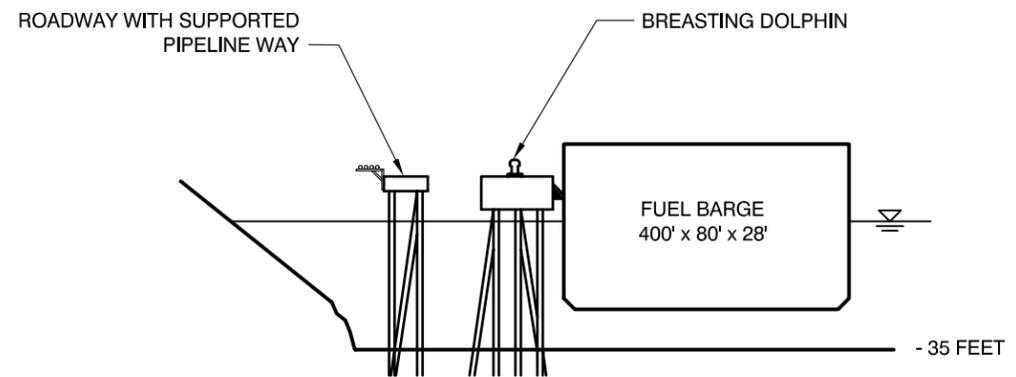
CONCEPTUAL DESIGN - ALTERNATIVE B - DETAIL SECTIONS
